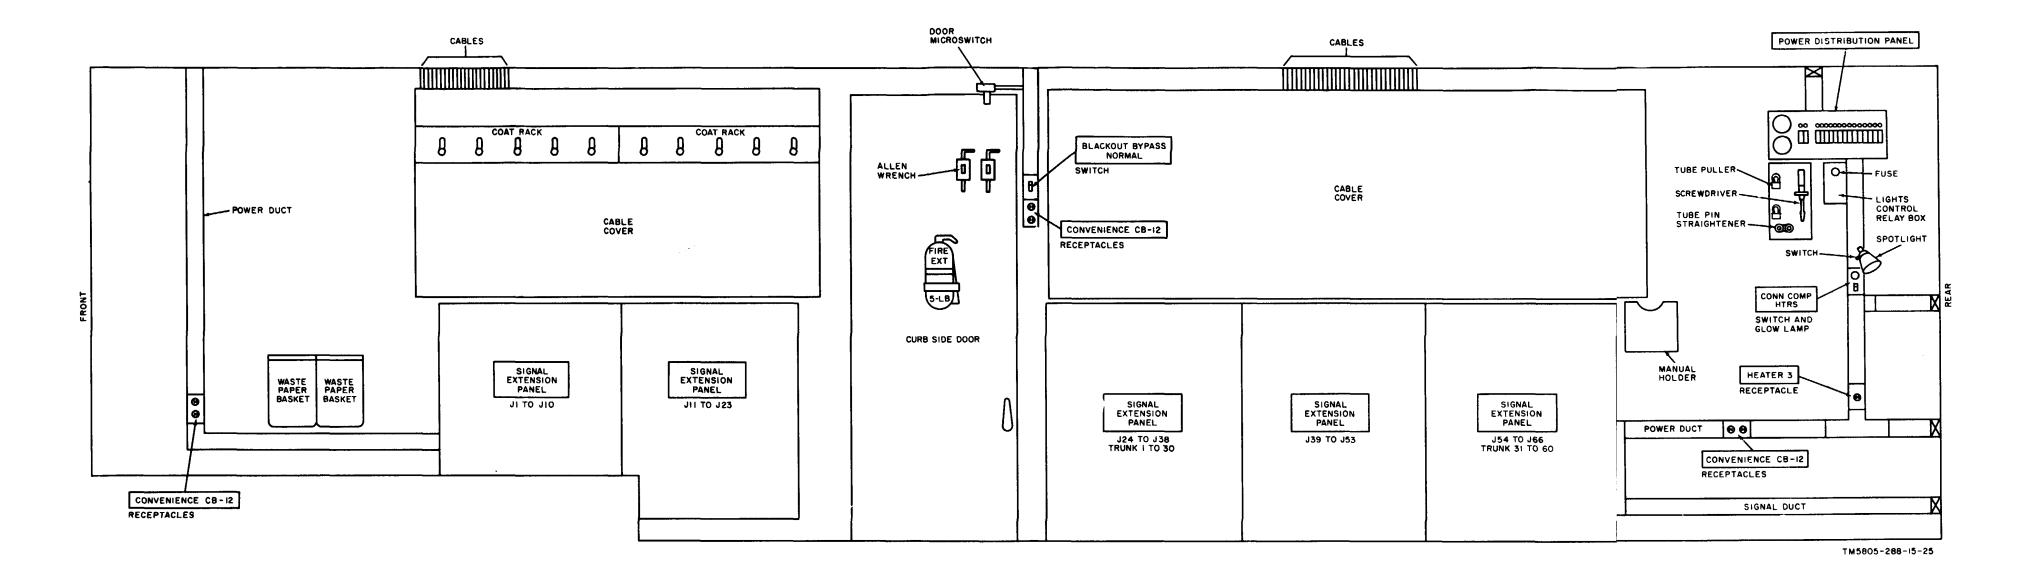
Telephone Switchboard Group AN/MTA-7, curbside wall, elevation diagram.
